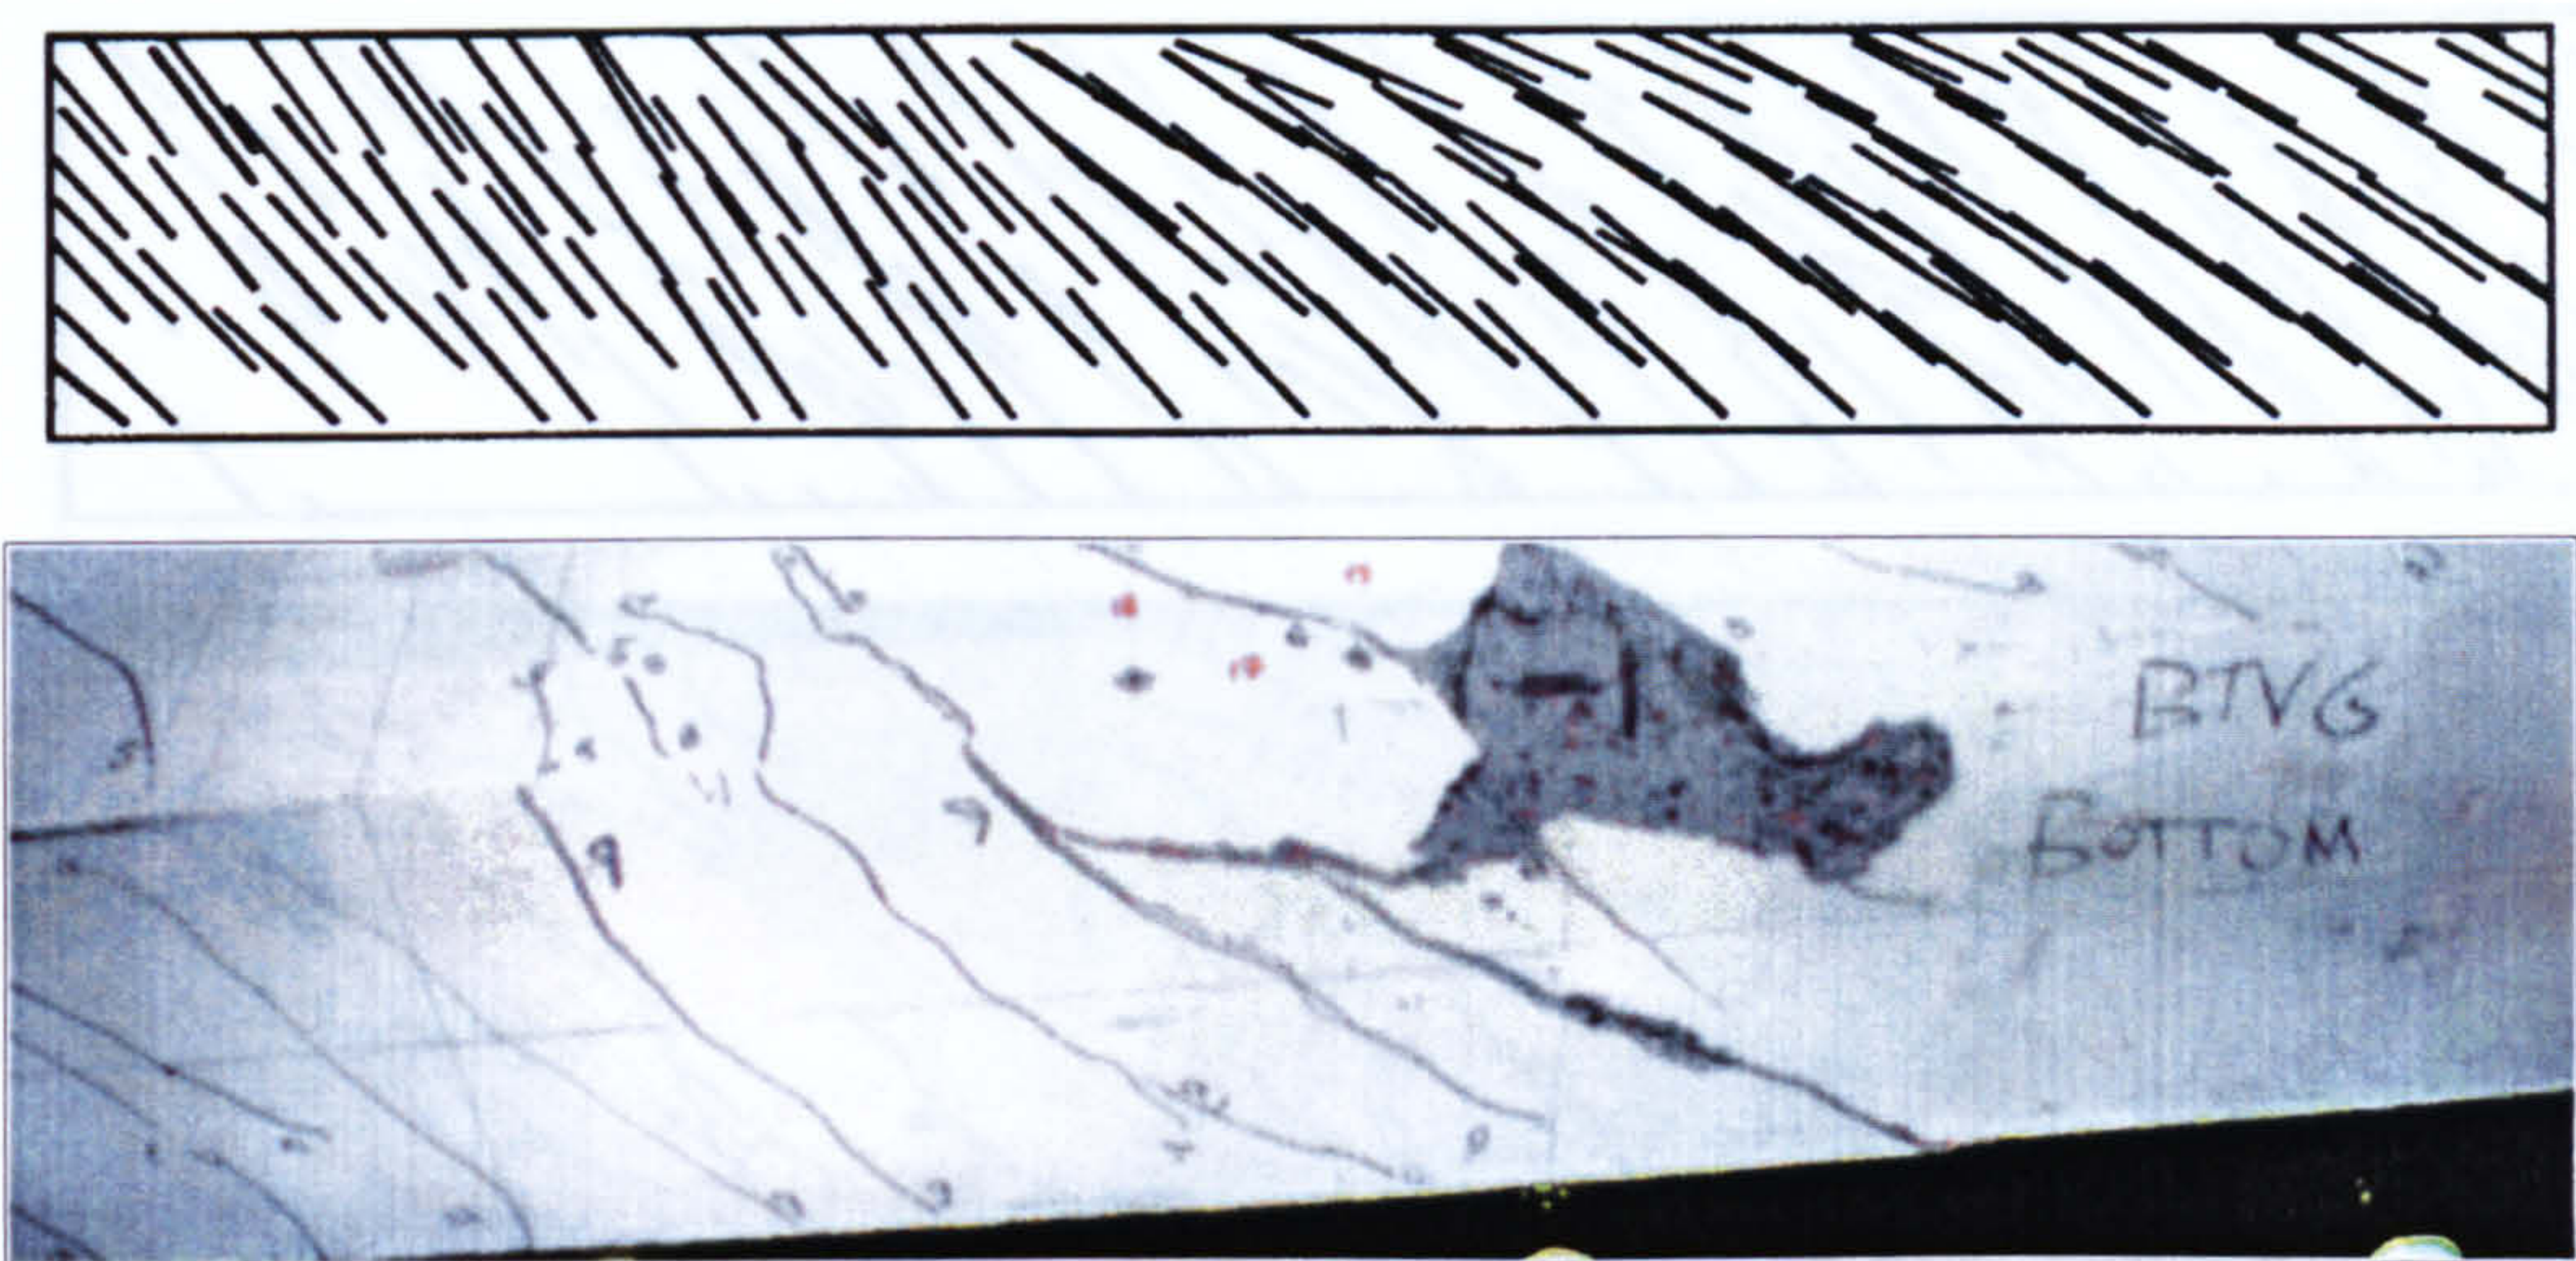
Crack development in the bottom flange (BTV6)
